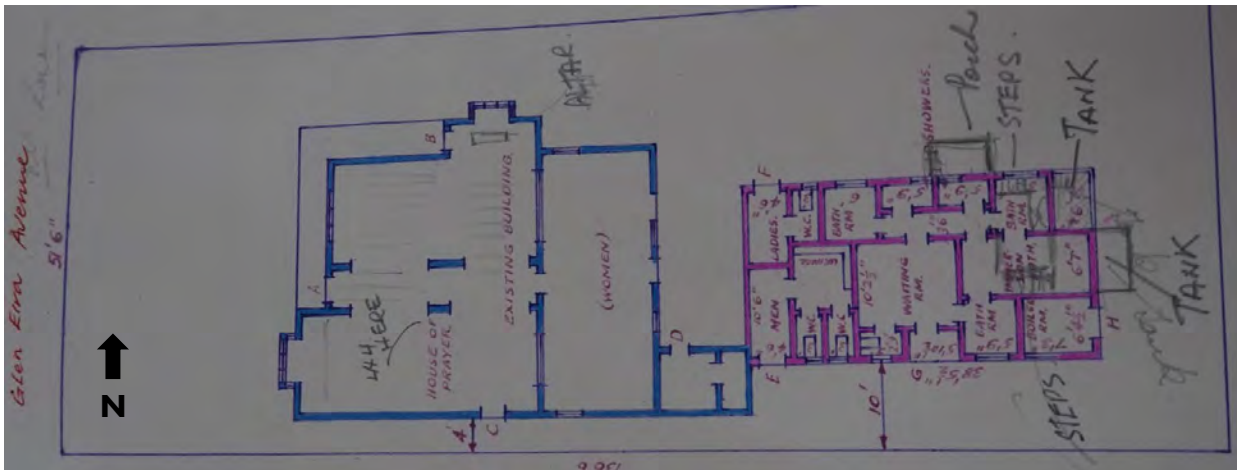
Plan from public building file, dated 1950, showing the former house (left) and the proposed mikvah (right). (Source: Public Record Office Victoria, VPRS 7882, P1, Unit 1511, Item 12839)
